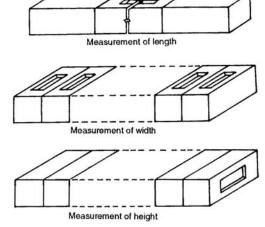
Measurement of Tolerances of Common Building Bricks
